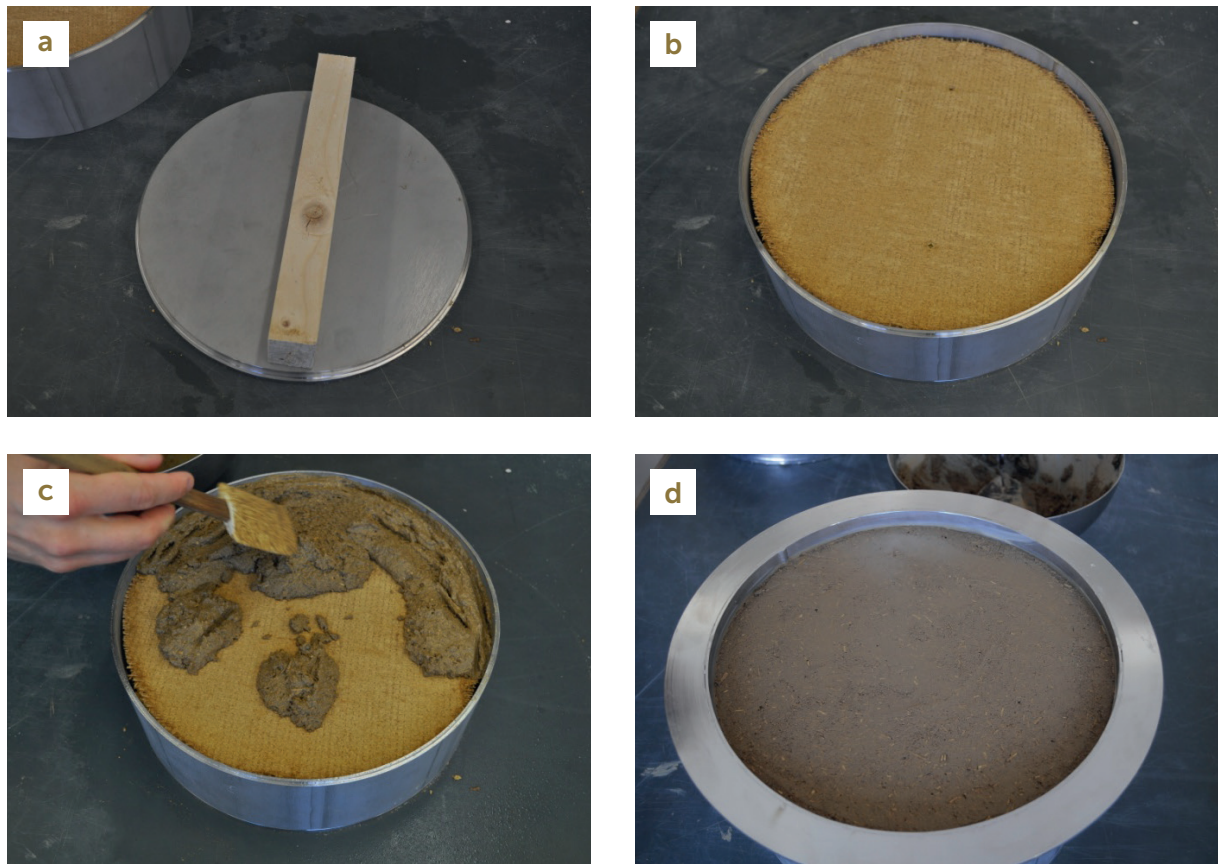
Preparing a sample for testing: (a) Timber stud, (b) Earth building board with wood-fibre insulation behind, (c) Application of earth adhesive, (d) Application of the clay plaster and mounting of a flange ready for installation into the test chamber.
